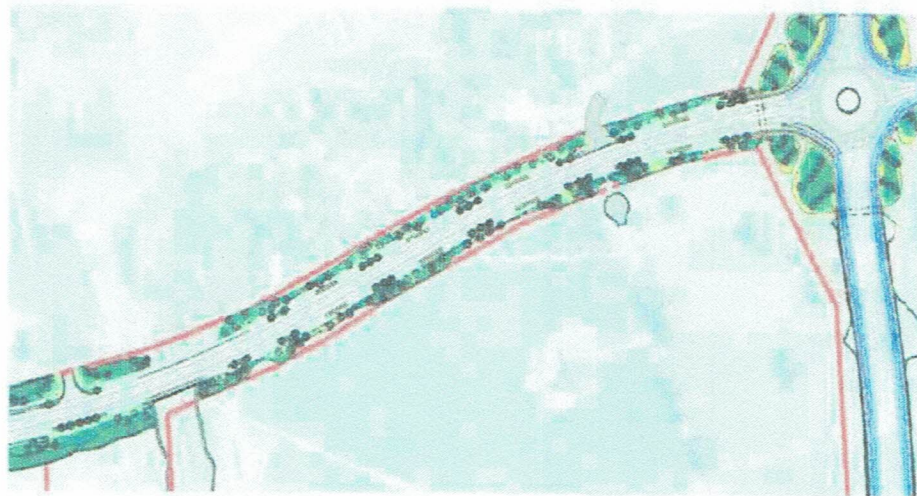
Concept Plan (Intersections and property access part of detailed design)
